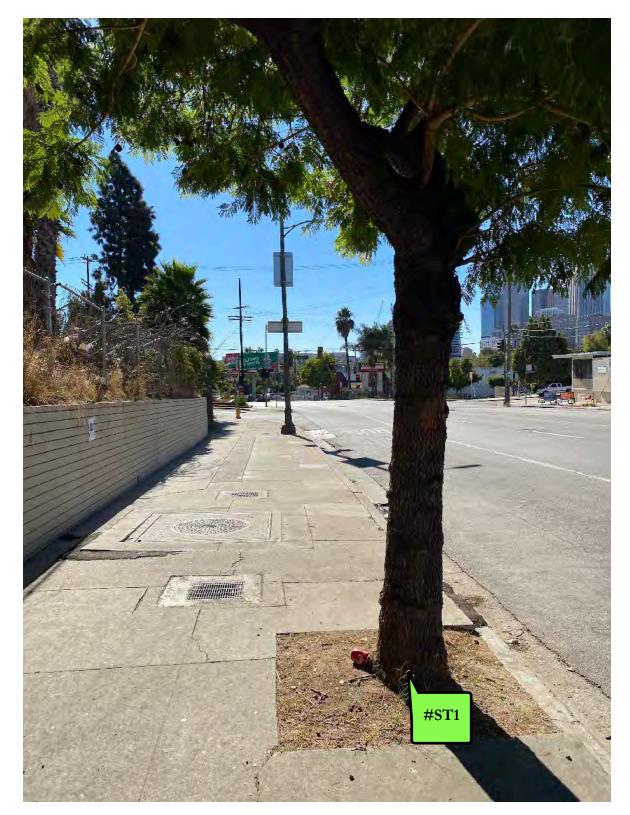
Street Tree #ST1 - retained and protected in place
